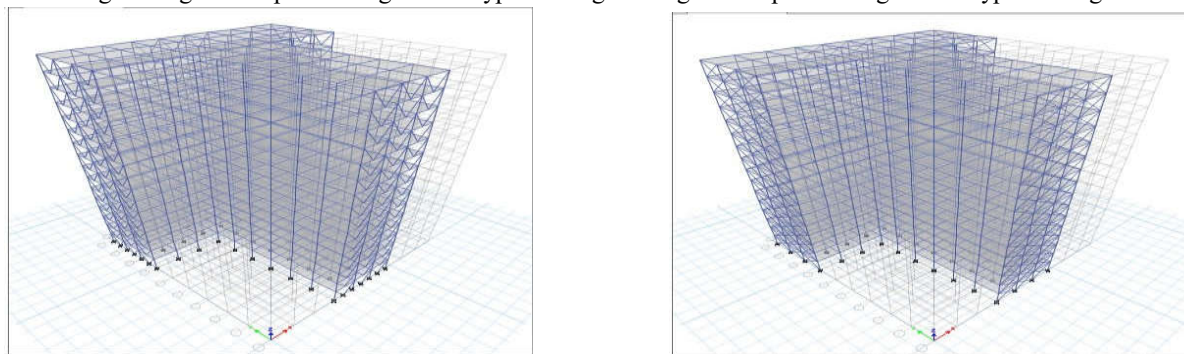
T Shape Building with V type bracings & T Shape Building with X Type Bracings
